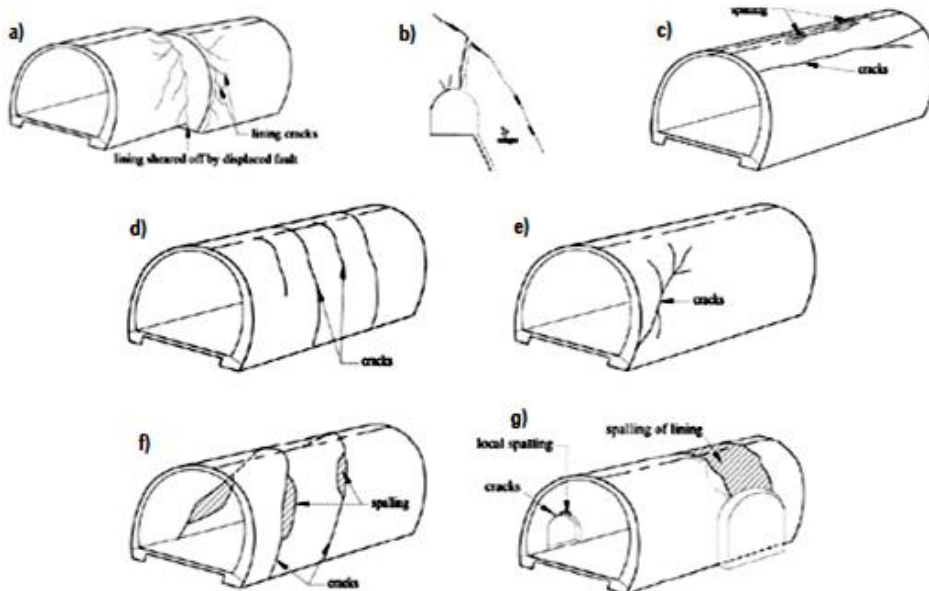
Example of damage to tunnel structures due to earthquake events [7]
